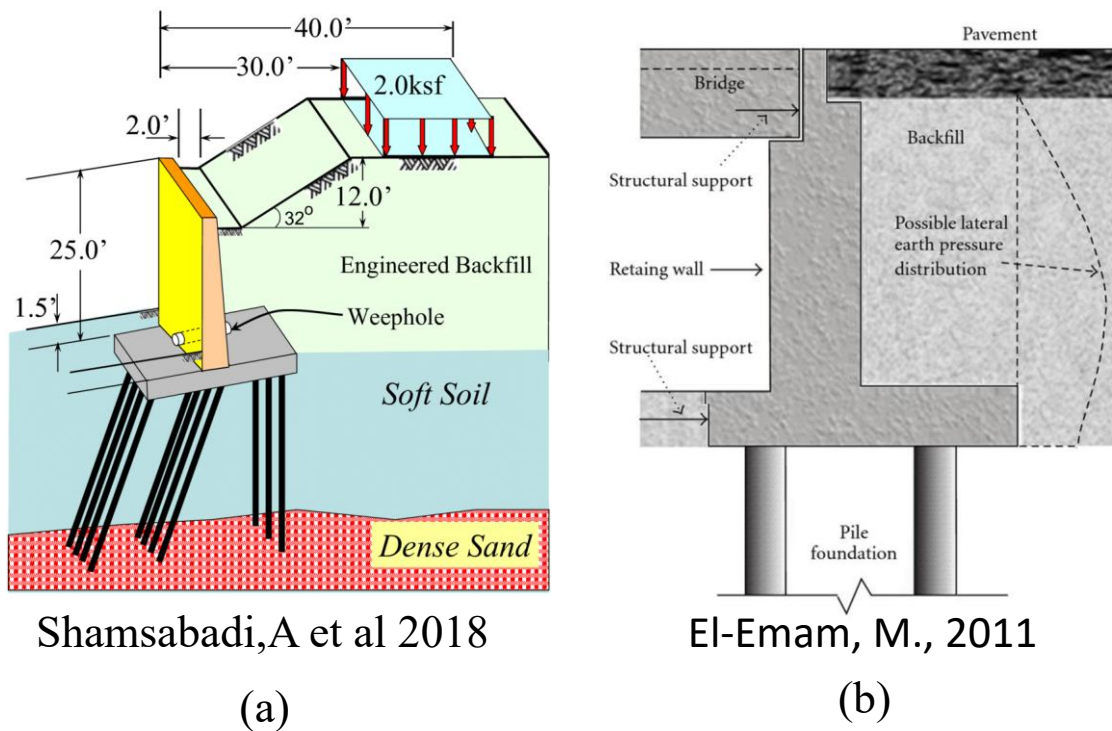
Pile supported (a) retaining wall and (b) abutment
